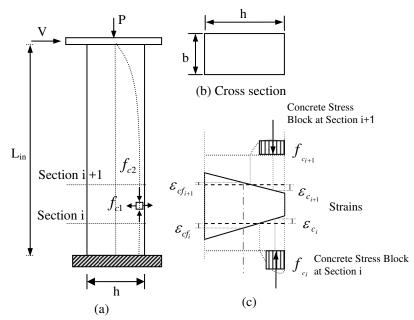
A reinforced concrete column subjected to shear and axial loads; a) Concrete principal compression stress pattern, b) Cross section, and c) Stress blocks and strains at two adjacent sections.
